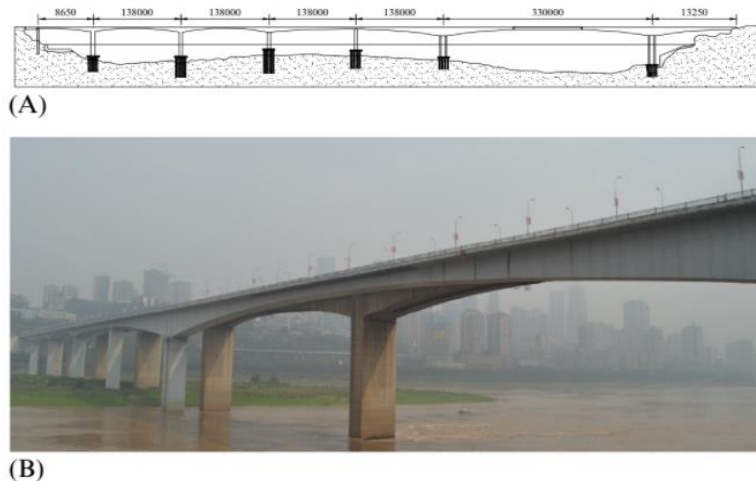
The second Shibsanpo Bridge in Chongqing, China. (A) Layout of the bridge. (B) Main span after construction. (Photos by Yan.)
